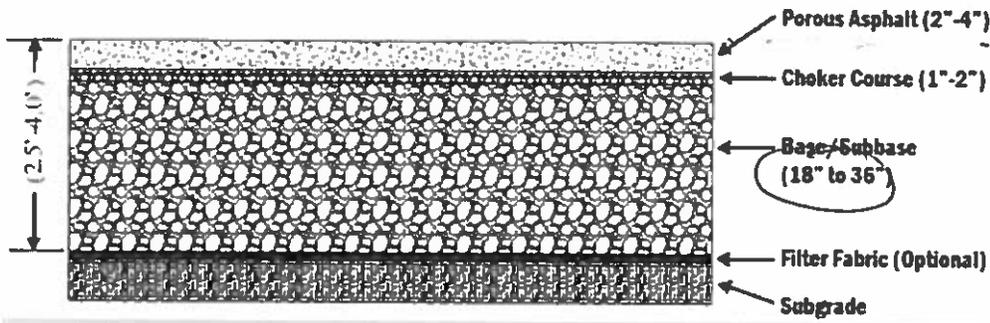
Typical Porous Asphalt Pavement Section (diagram adapted from US EPA)
